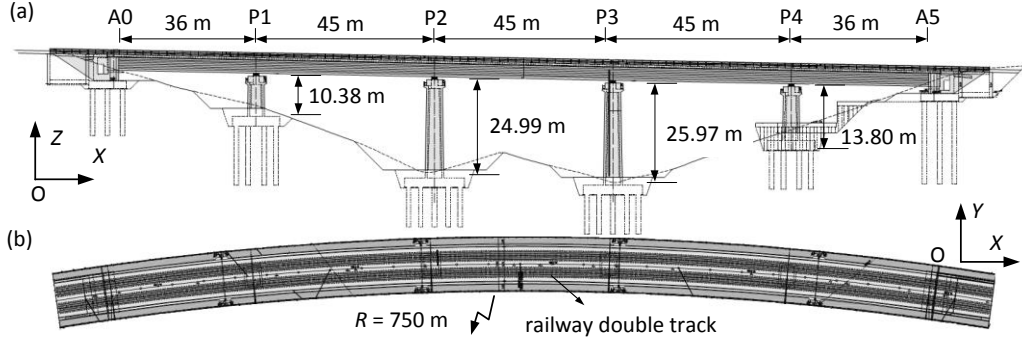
The examined curved railway bridge: (a) elevation, (b) plan view.
